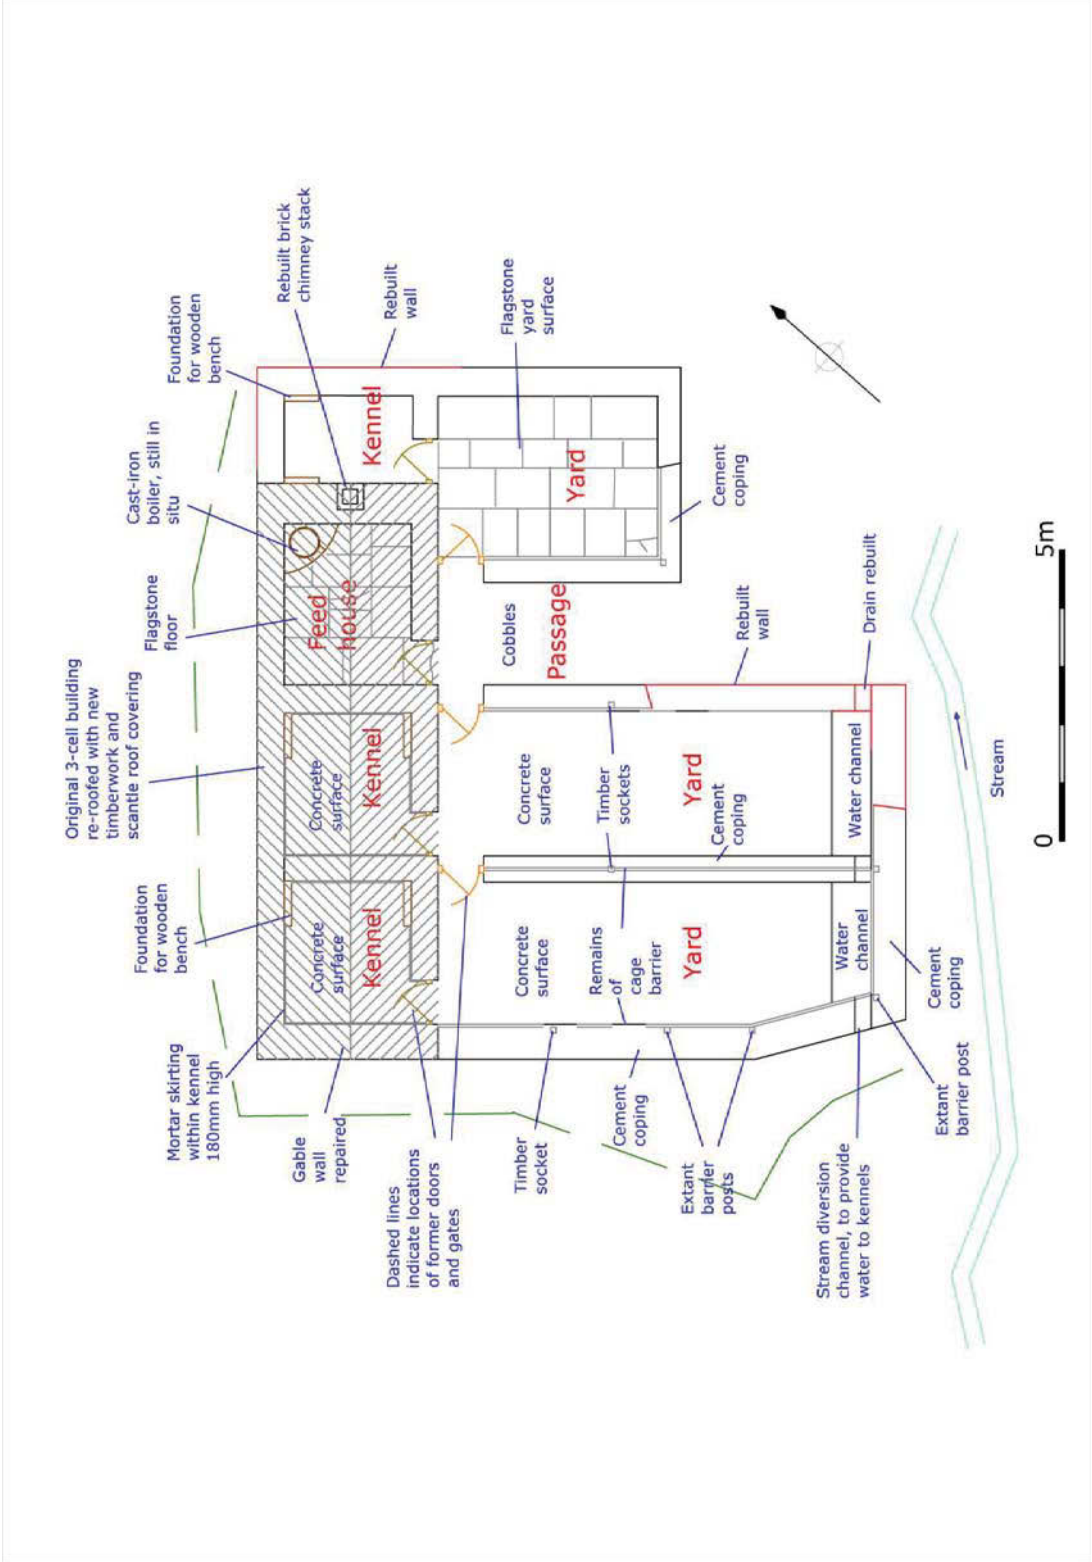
Plan of the kennels, after renovation works and replacement of the roof.
